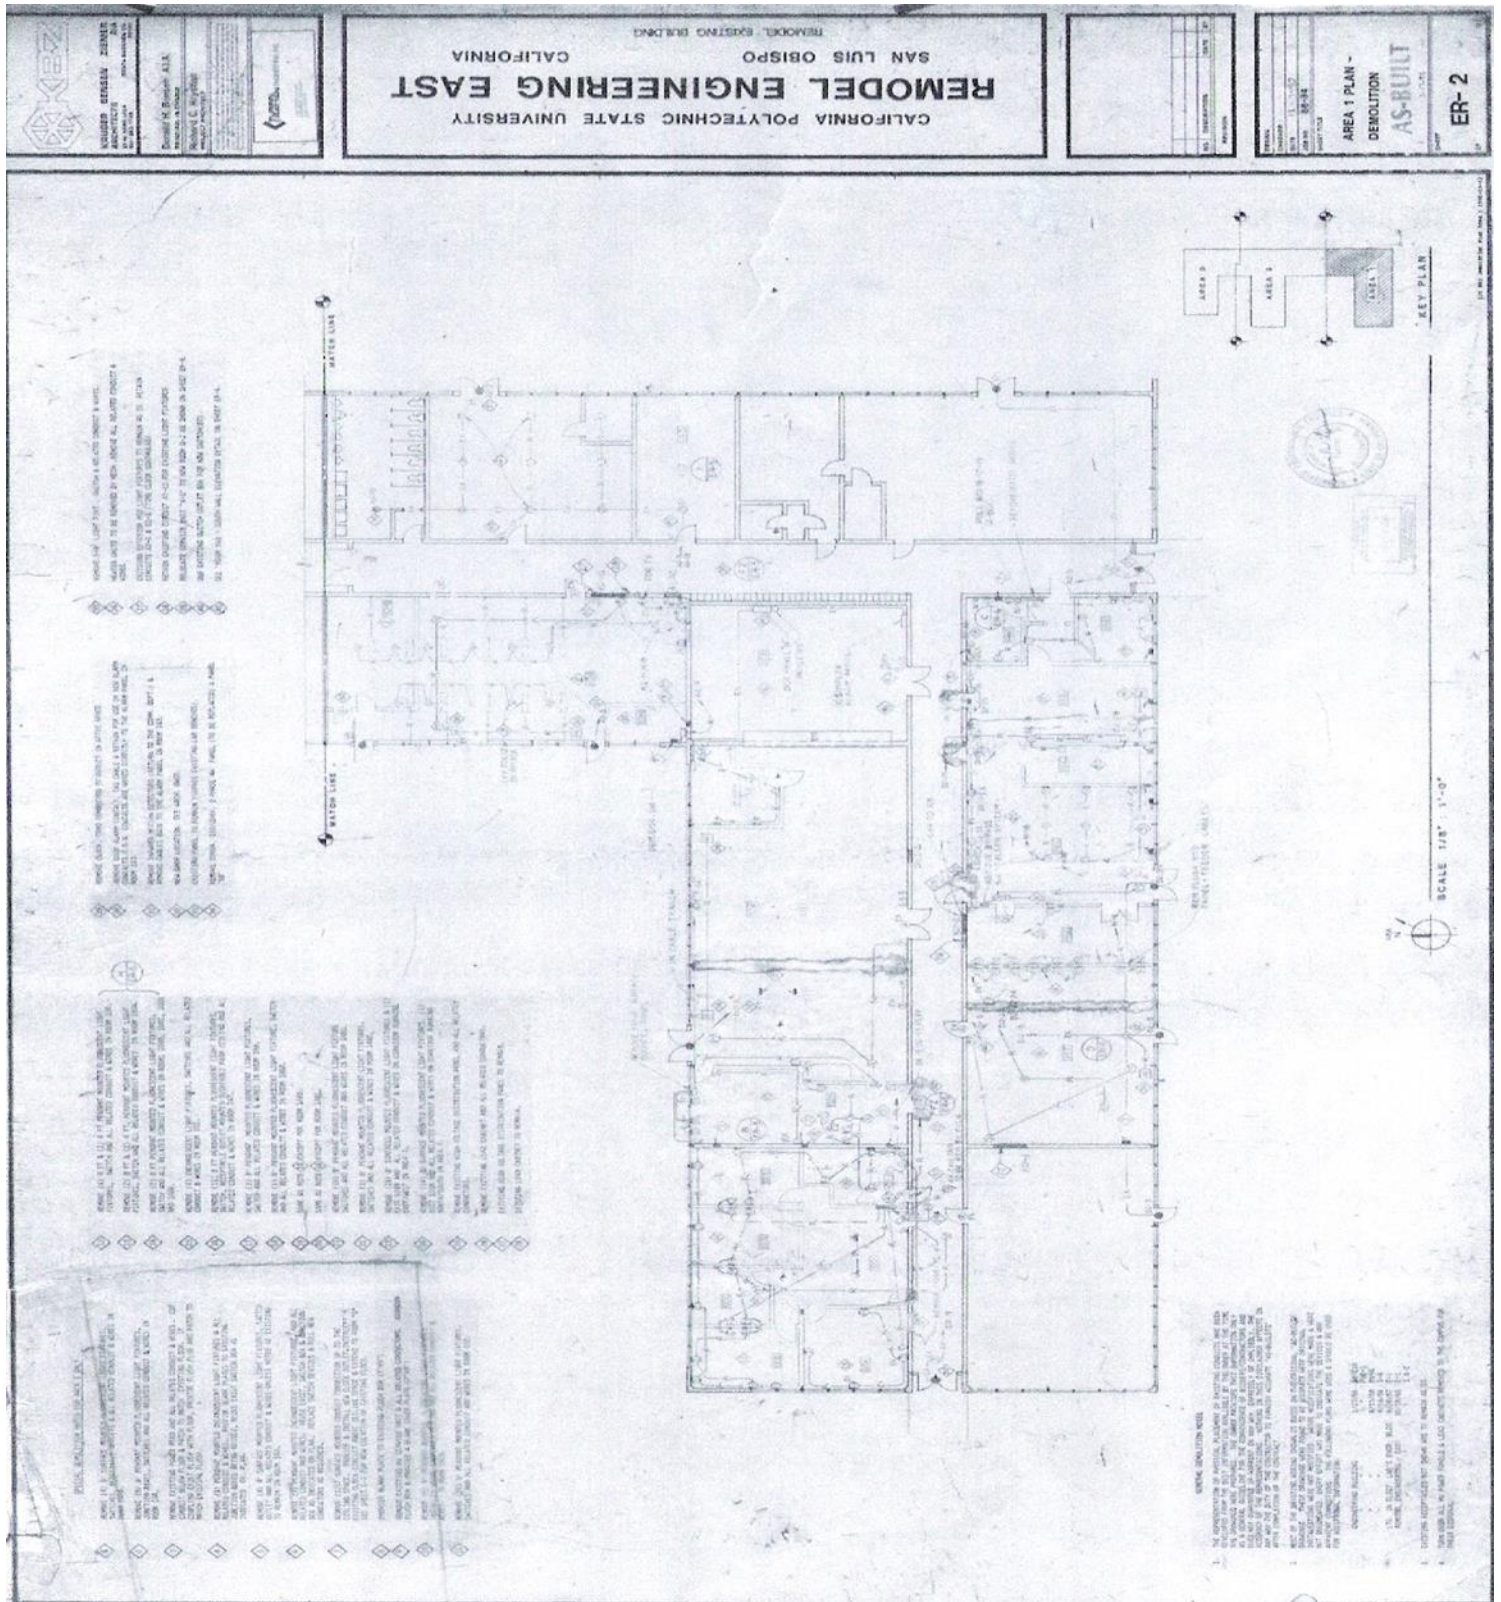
1990 Remodel Plans & Interconnections Building 20 South
